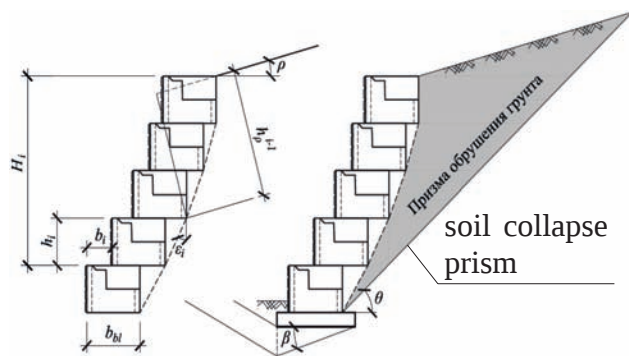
Cross-section of a retaining wall made of blocks infilled with crushed stone
